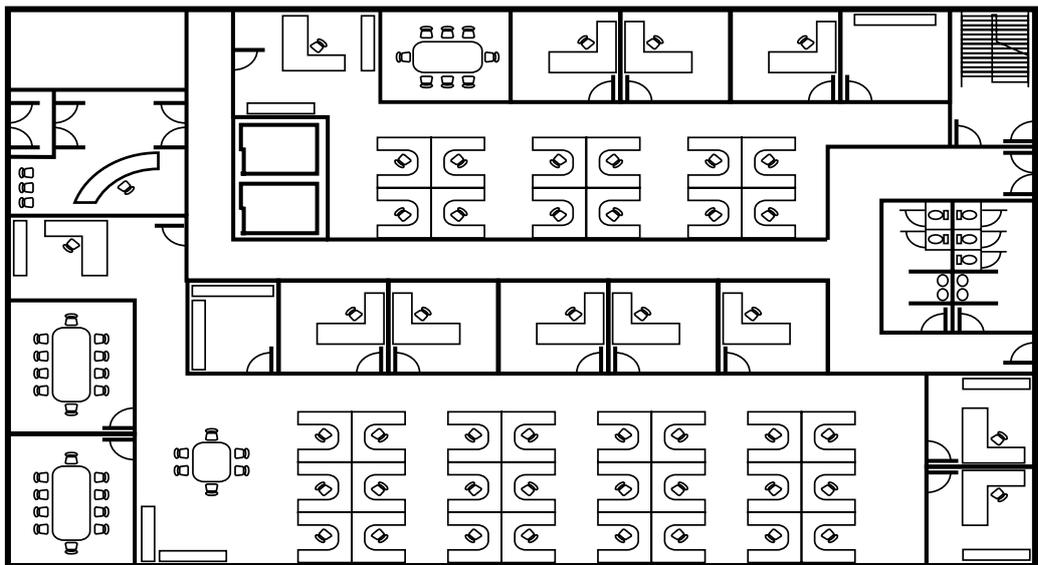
FLOOR PLAN OF BUILDING TO BE SURVEYED
